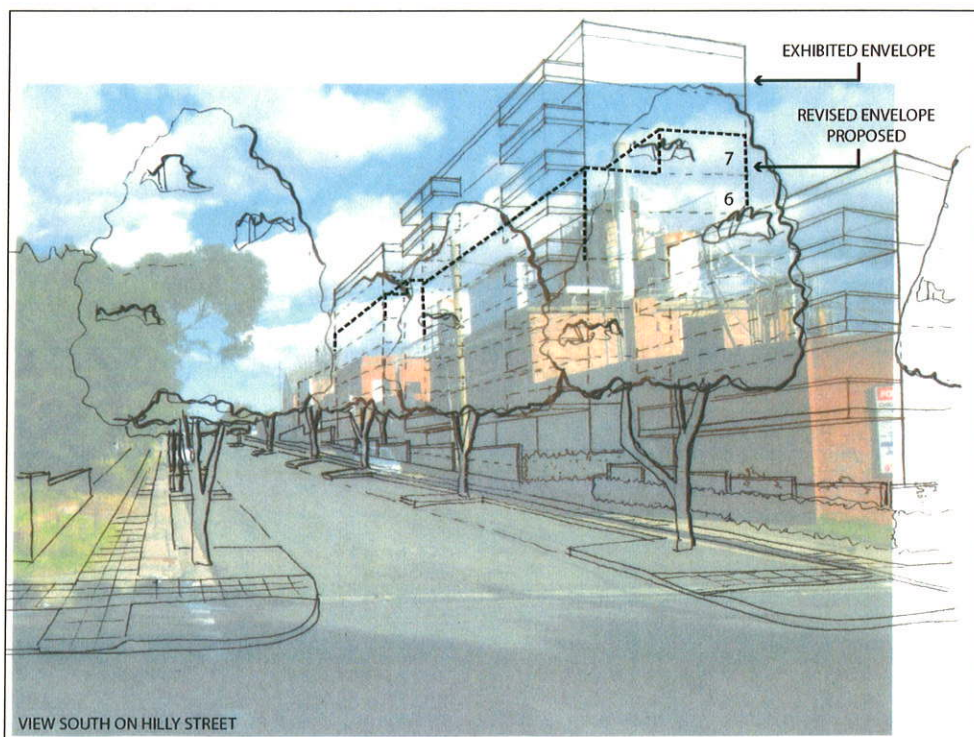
Revised Hilly Street Montage Showing Part 6/Part 7 storey building (Source: PPR, 2012)
